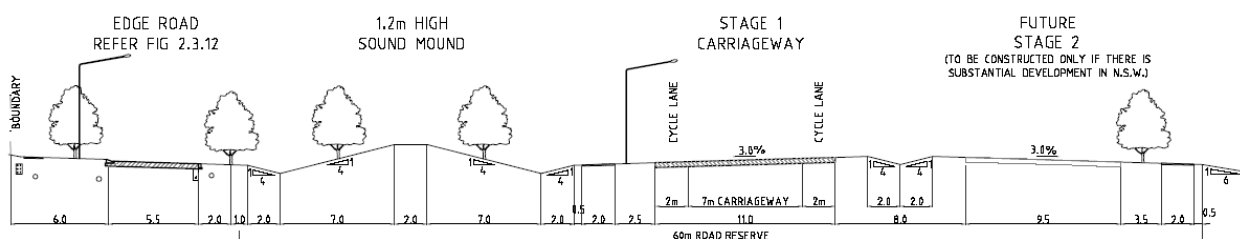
Typical Section: Parkway arterial (eastern boundary of Bonner)
